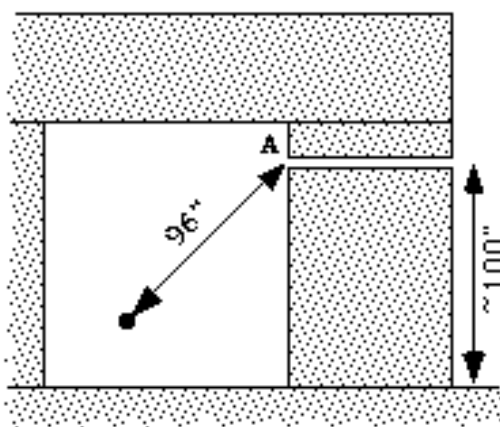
Geometry Considered for the Penetrations in the 6-Foot-Thick Side Concrete Walls
